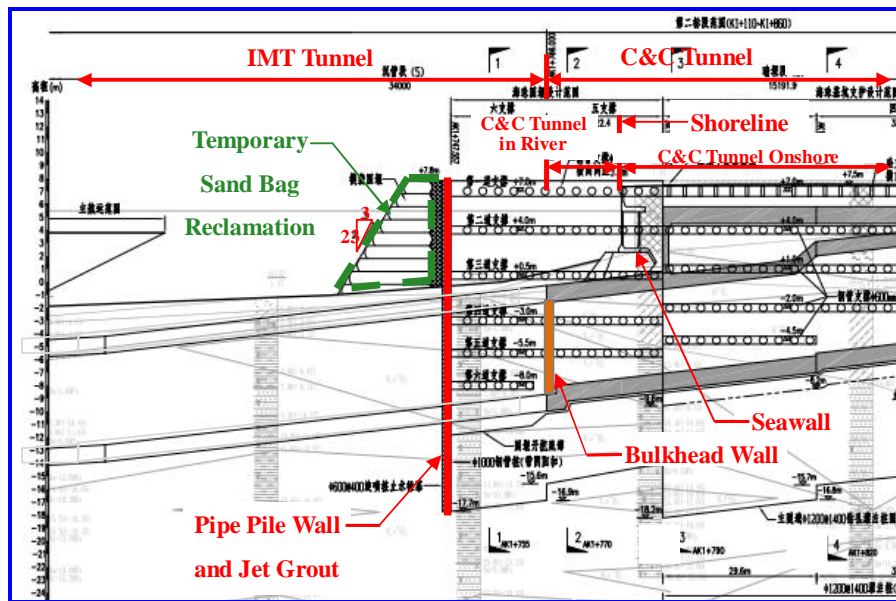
Longitudinal section of temporary reclamation and excavation and support system
